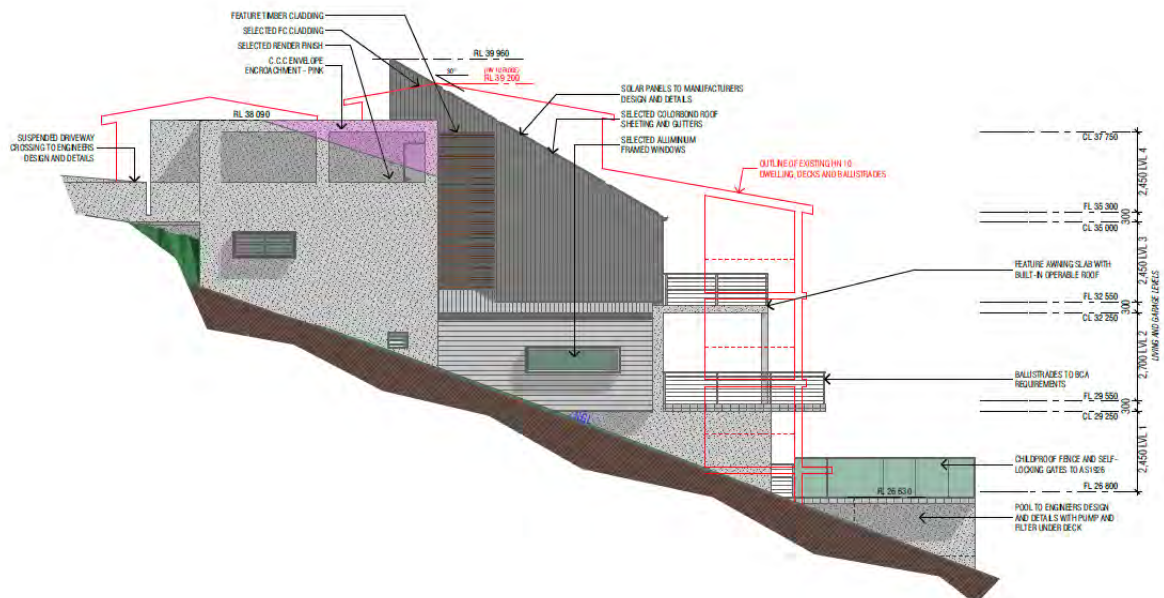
southeast elevation of proposed dwelling including the profile of the northwestern adjoining dwelling outlined in red
